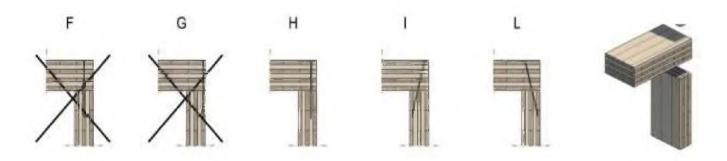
details for screw insertion in wall to floor connections. To be avoided: F, G; Recommended but very difficult: H; Recommended: I,L.
